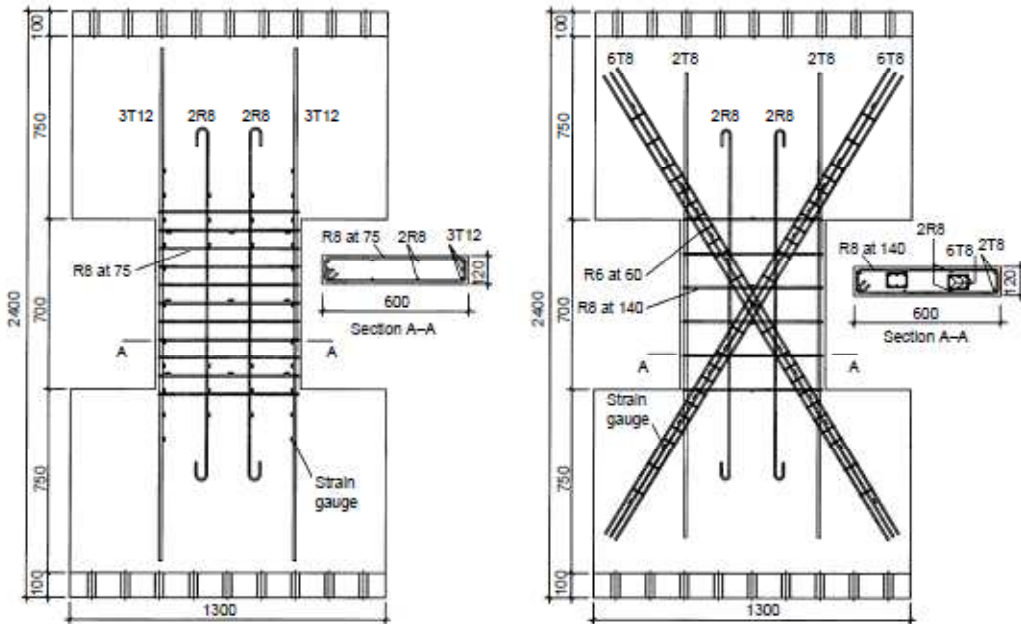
Reinforcement Layouts for Coupling Beam Specimen (Kwan and Zhao, 2002)
